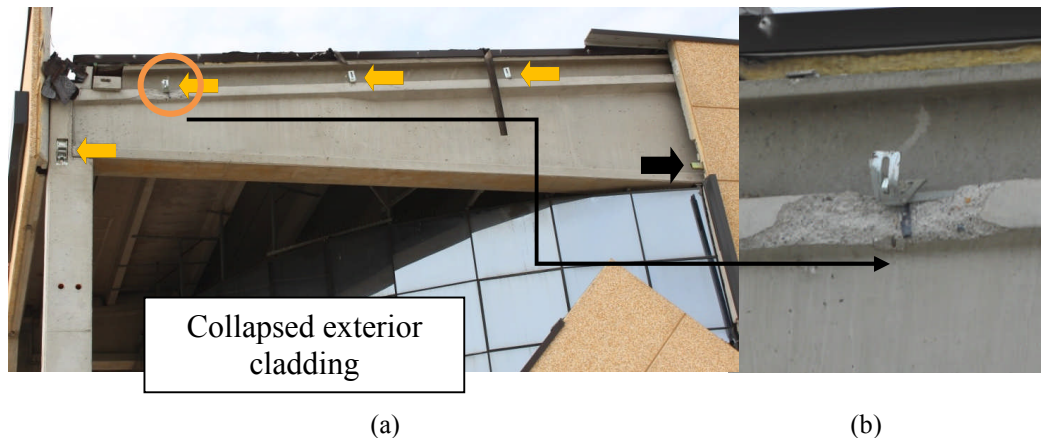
(a) Cladding panel collapse after failure of the connections with the main structure (orange arrows showing the location of connections of the collapsed exterior cladding); (b) Detail showing failure of the mechanical connection.
